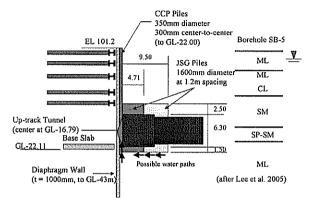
Collapse of tunnel portal, O2 Station, Kaohsiung MRT
